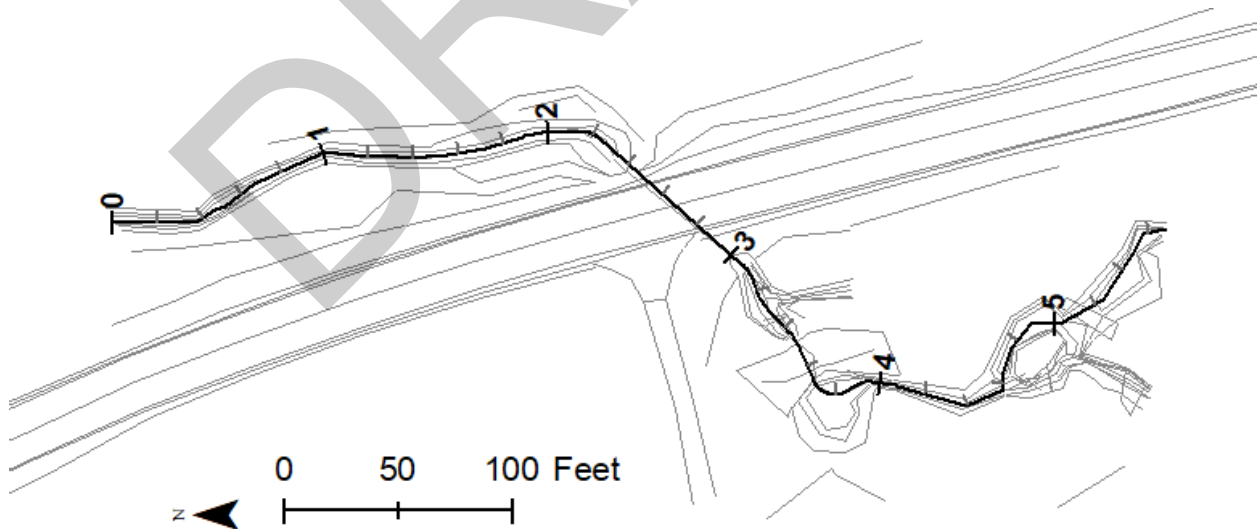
Longitudinal profile stationing for existing, natural, and proposed conditions
